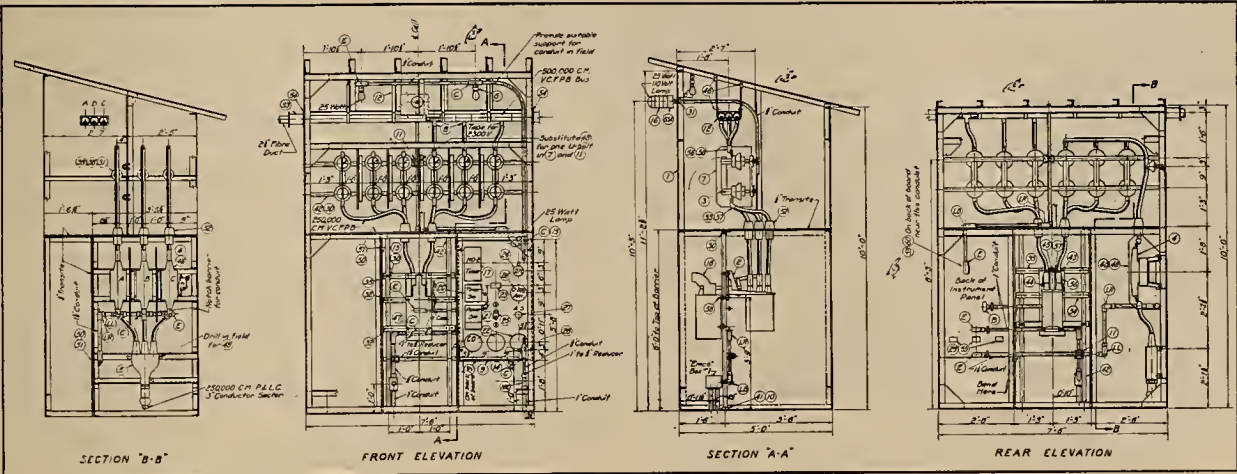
Details of 4-kv. switching and metering equipment housed in steel unit-cells, Almaden substation.
